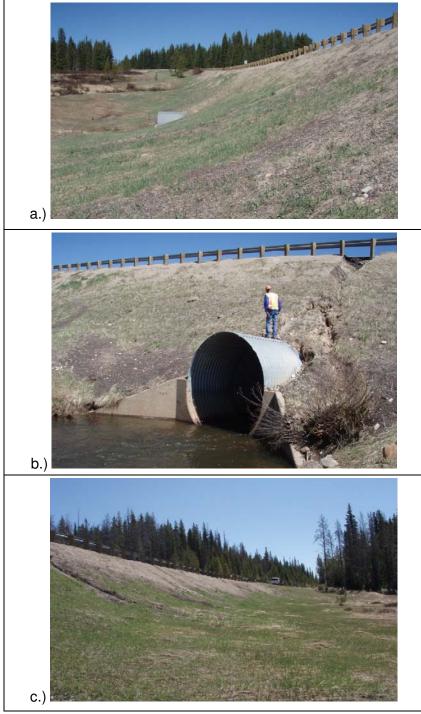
a.) Photo taken on south side of highway, looking west at elevated road grade. b.) Muddy Creek culvert. Note the large erosion runnel cutting into, and extending from road surface. The dark material adjacent to the culvert is scoria. c.) Photo looking east from south side of the road at elevated road grade.
